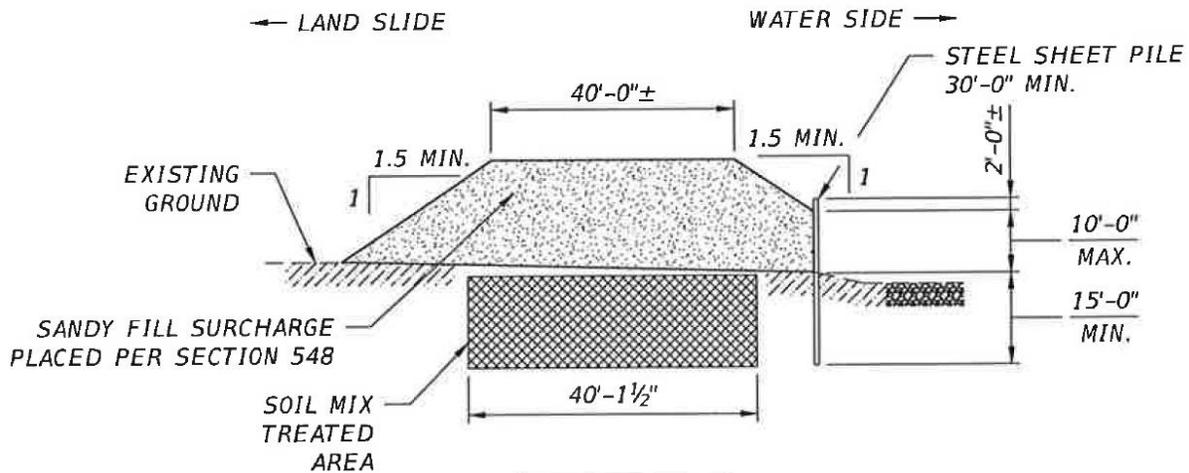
Surcharge test section showing sheet pile containment (FGE, 2014).
